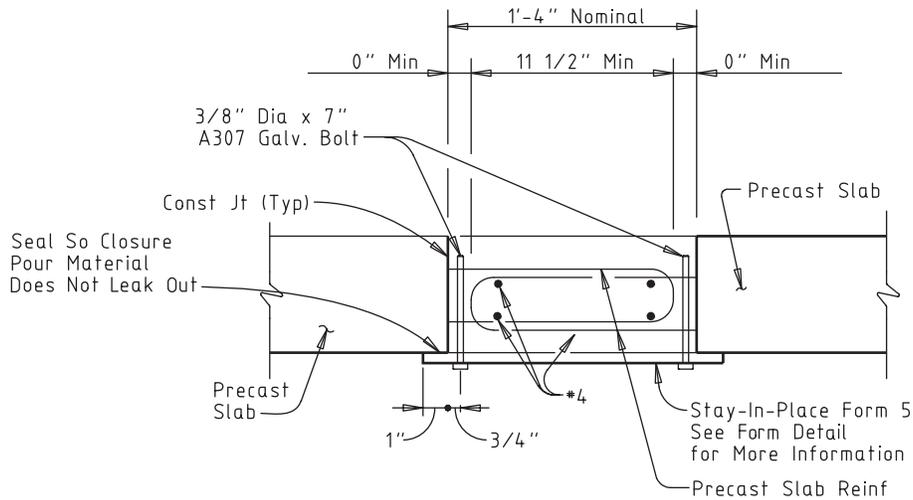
Steel tub-girder longitudinal closure pour detail.
